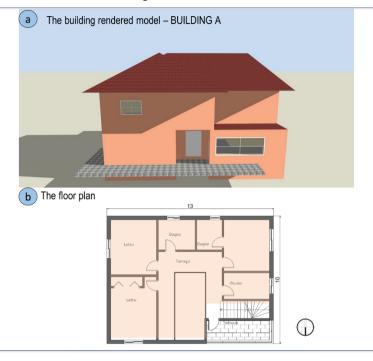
The single-family house: a) Rendered view of the building, b) Indoor distribution of the building for the first floor
